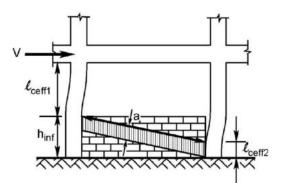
Short column due to columns restrained by partial masonry infill walls (NZSEE study group on earthquake risk buildings, 2006)
